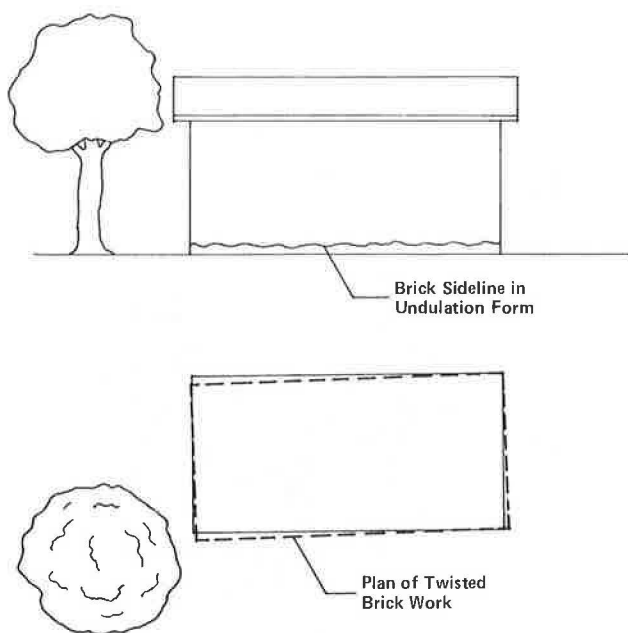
Orthogonal projection of twisted house near jarrah.
